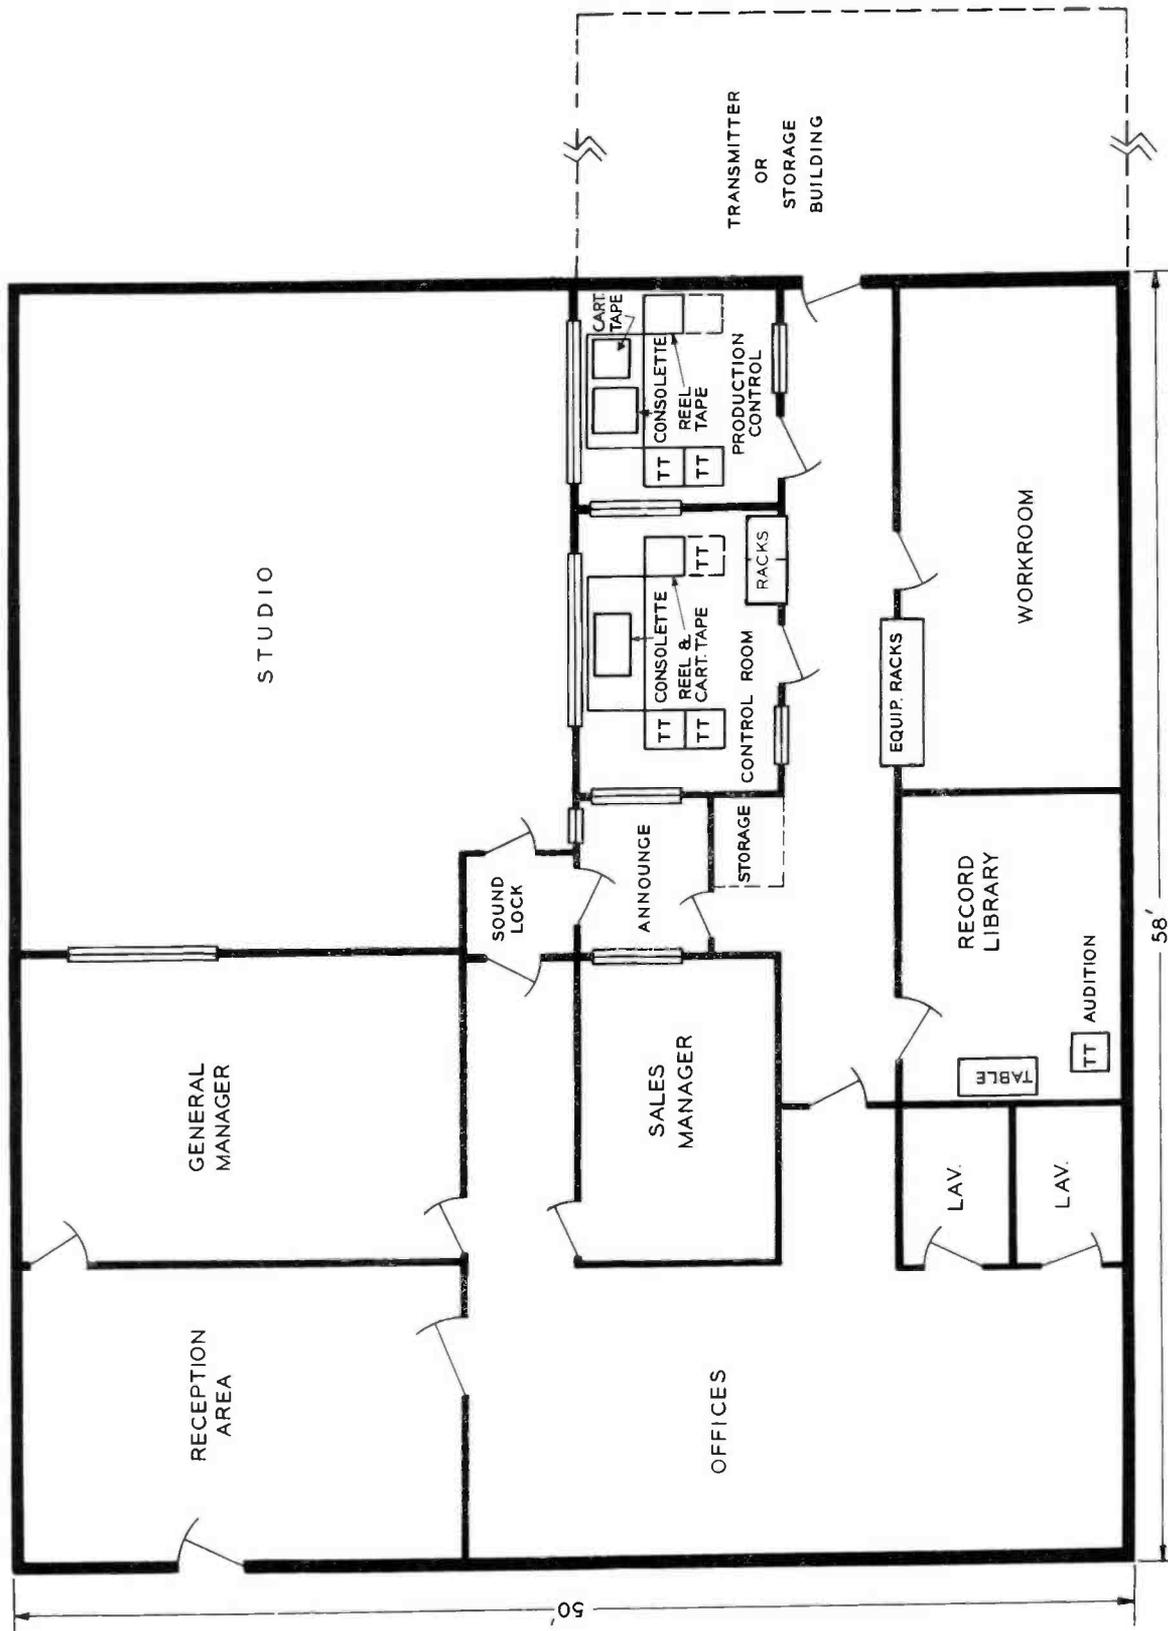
Floor plan and equipment layout for Plan "B" station.
